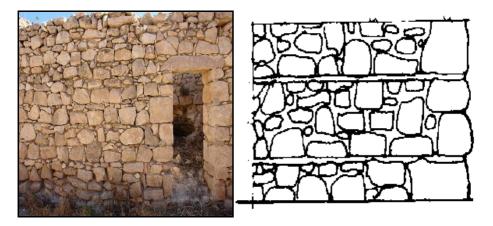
Illustrate the layout of rubble rows and their reinforcement with small stone
